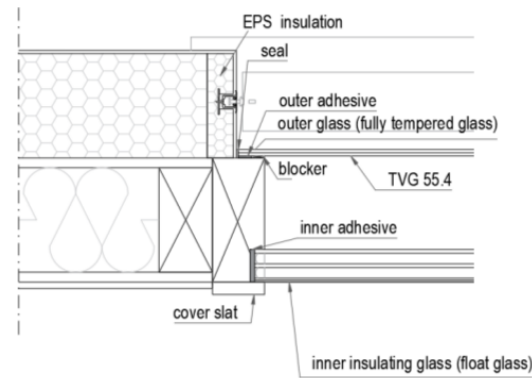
Schematic presentation of a DSF load-bearing structural wall element [19].
